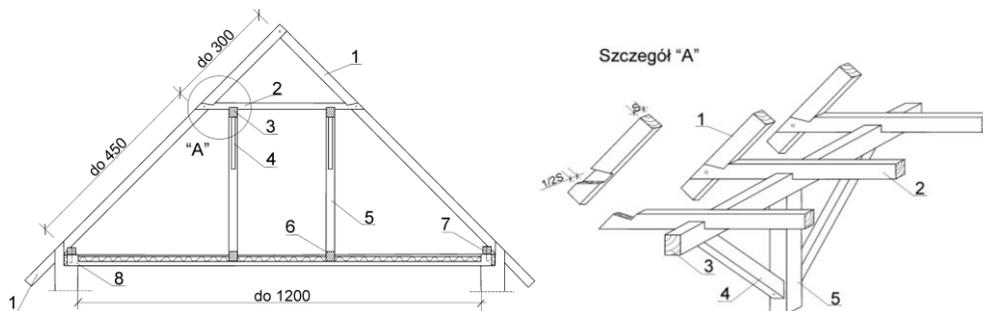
Collar-beam roof with supported in two points collar rafters: 1 - rafter, 2 - collar rafter, 3 - purlin, 4 - angle brace (angle tie), 5 - post, 6 - ground sill (sleeper, sole-plate), 7 - plate, 8 - reinforced concrete curb-plate
